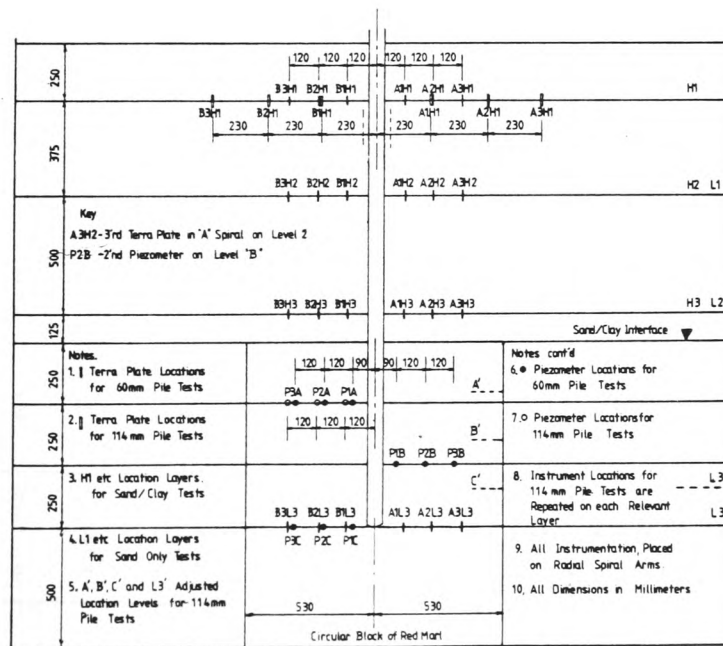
SHOWING GENERAL LAYOUT OF ADDITIONAL INSTRUMENTATION
